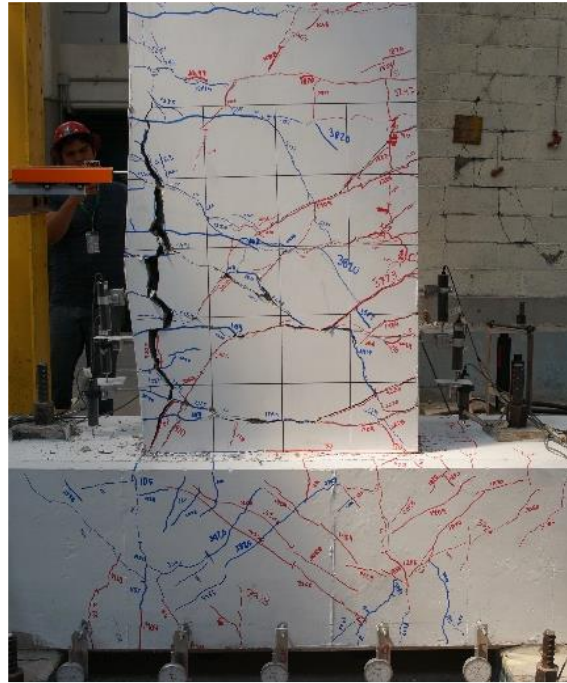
Concrete spalling due to rebar buckling in specimen CIP-1B (3.5% drift).
